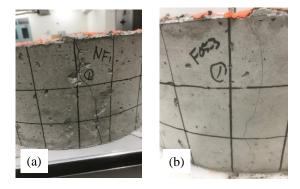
Crack of ring test specimens. (a) NF (b) F0.5
